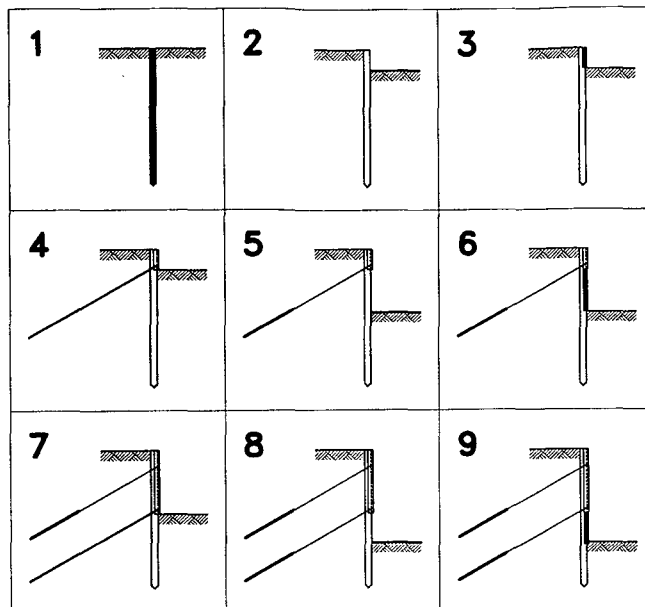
Installation phases for anchored discontinuous pile wall.
